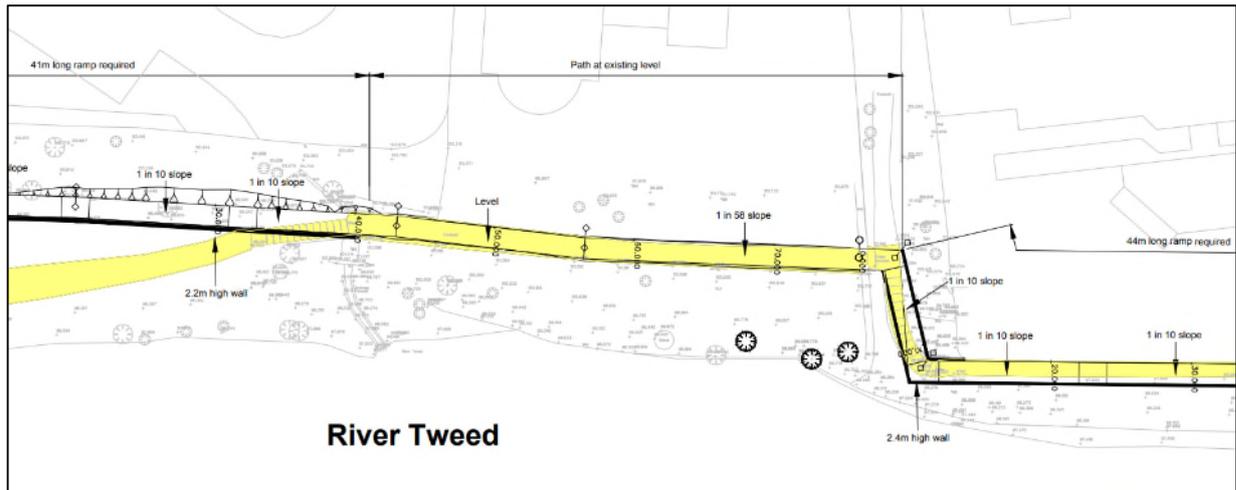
Extract from SBC design drawings showing 10% approach ramps and retaining walls
